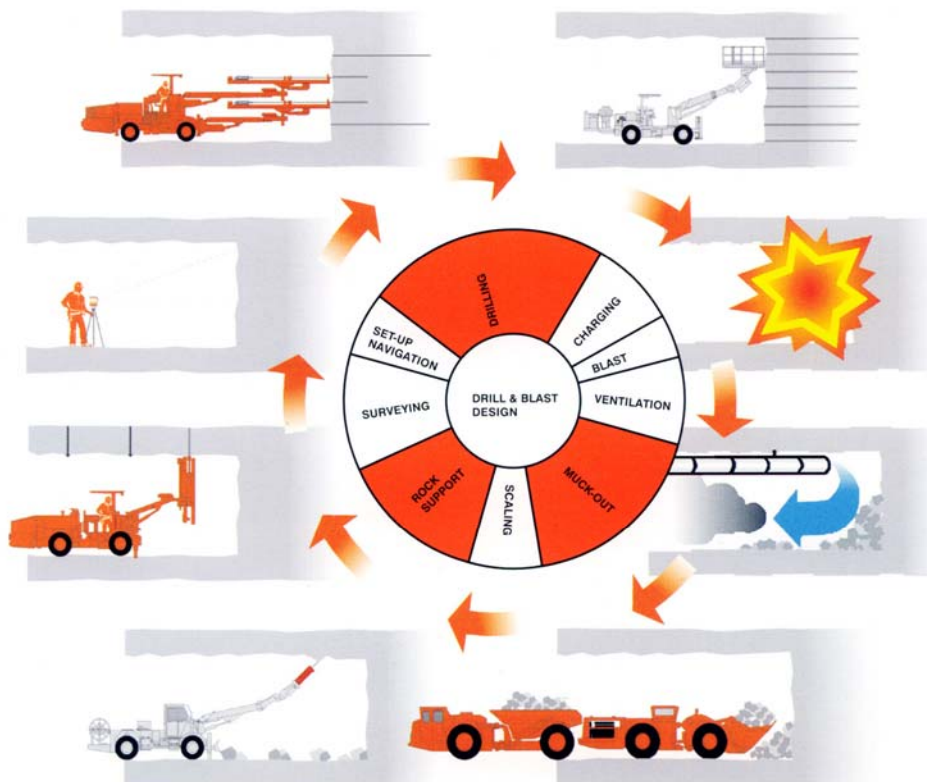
A tunnel drilling rig does not drill tunnels but blast holes (the phase on the top left corner). This process is used when drilling a tunnel in a hard rock. [Tamrock 1999].
